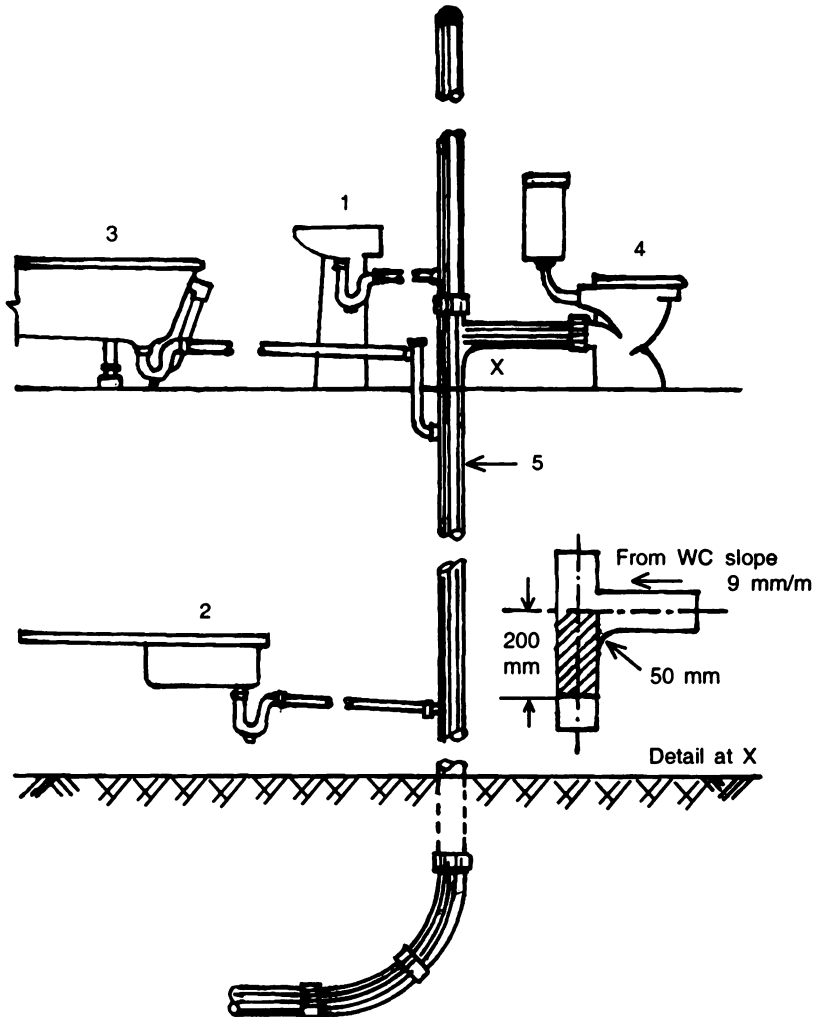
Single-stack drainage system without vent pipes: 1. Washbasin, 2. Kitchen sink, 3. Bath, 4. Watercloset, 5. Stack pipe.
